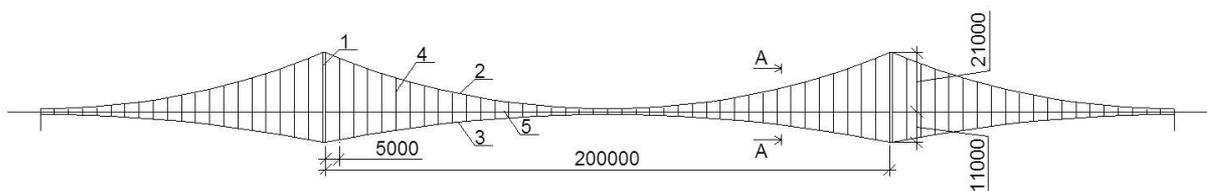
The bridge longitudinal view: 1 – pylon of the bridge; 2 – main load caring cable; 3 – stabilization cable; 4 – suspensions; 5 – deck
